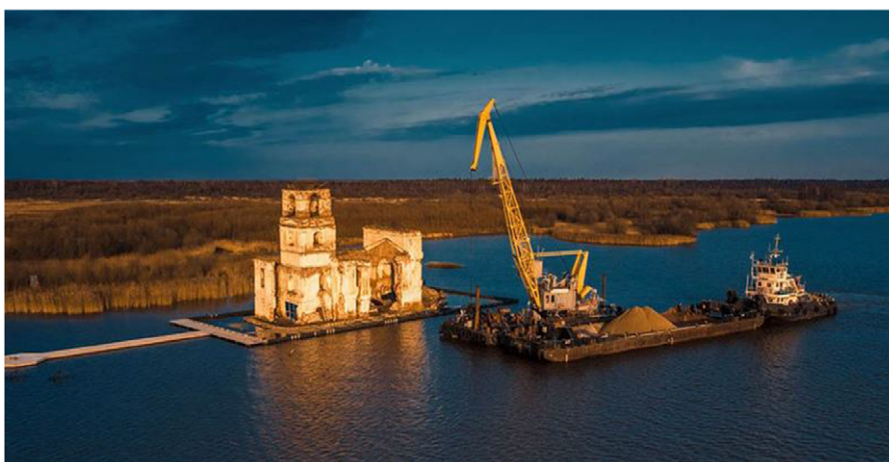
The Krokfino church with a dam and a pier constructed by the Krokfino Foundation.
